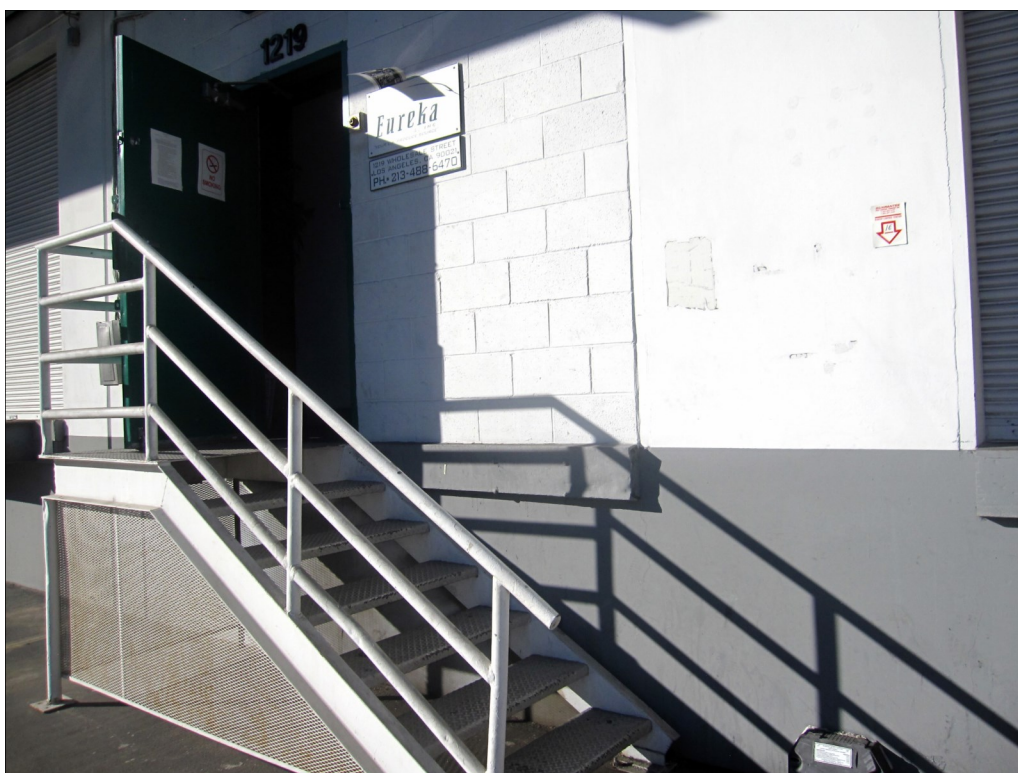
South building, south elevation, detail of individual warehouse entrance, view northwest (Snow, 2015)
